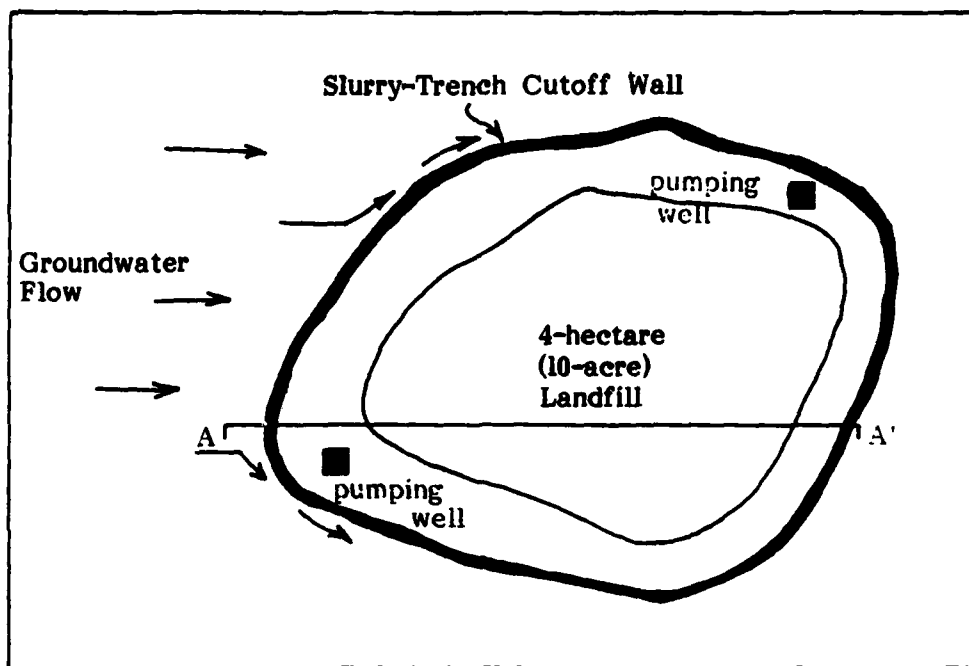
Plan View of a Slurry-Trench Cutoff Wall Completely Surrounding a Landfill (Tolman *et al.*, 1978)
